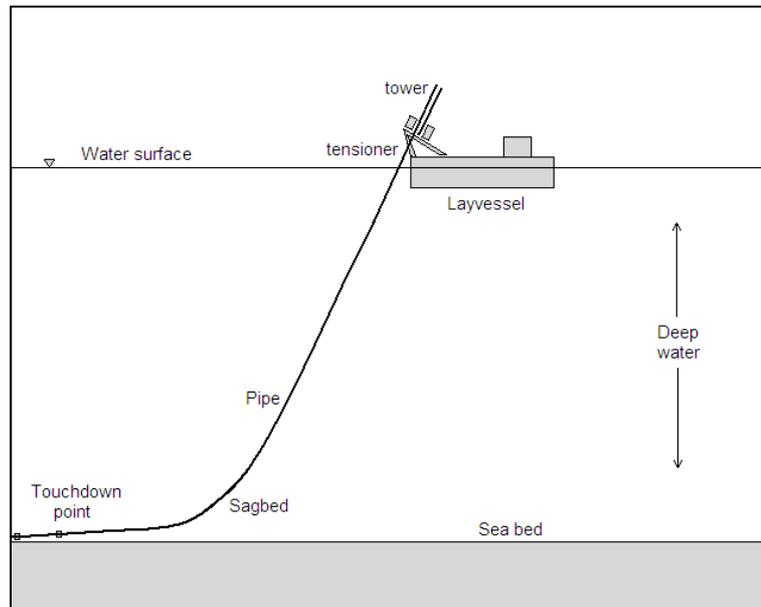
Schematic illustration of J-lay pipeline installation method
